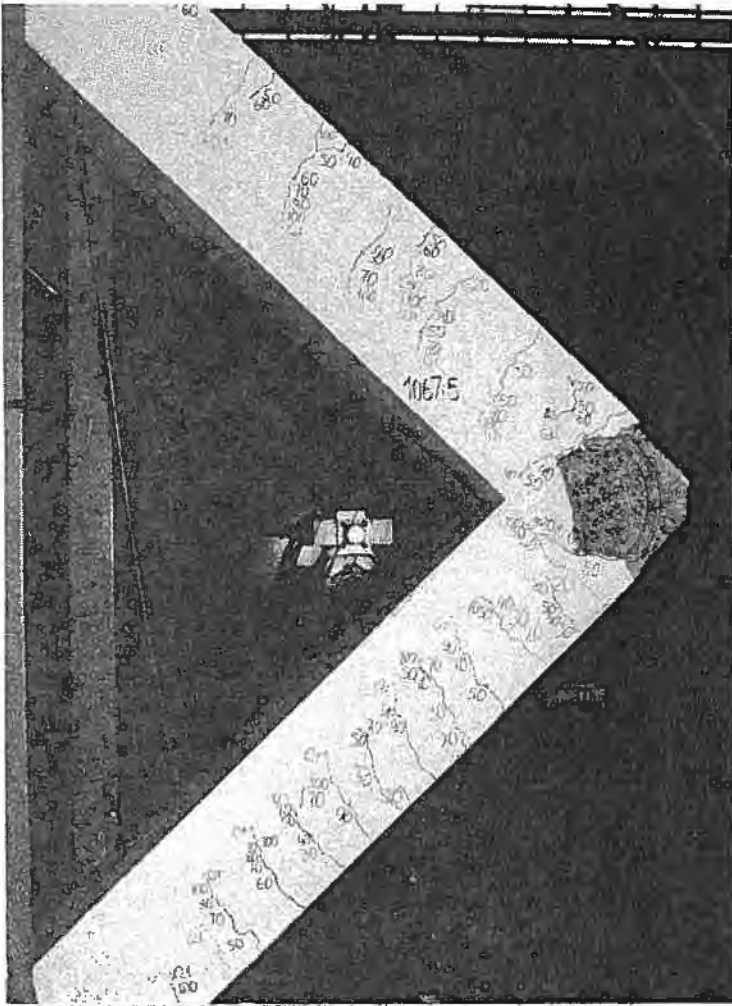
For the specimen with unspliced reinforcement and both tension reinforcement layers bent 90° , i.e. the same bending radius, spalling of the side concrete cover occurred after only about 400 load cycles. This failure could not be predicted with the current design model in the Swedish concrete codes, BBK 79.
